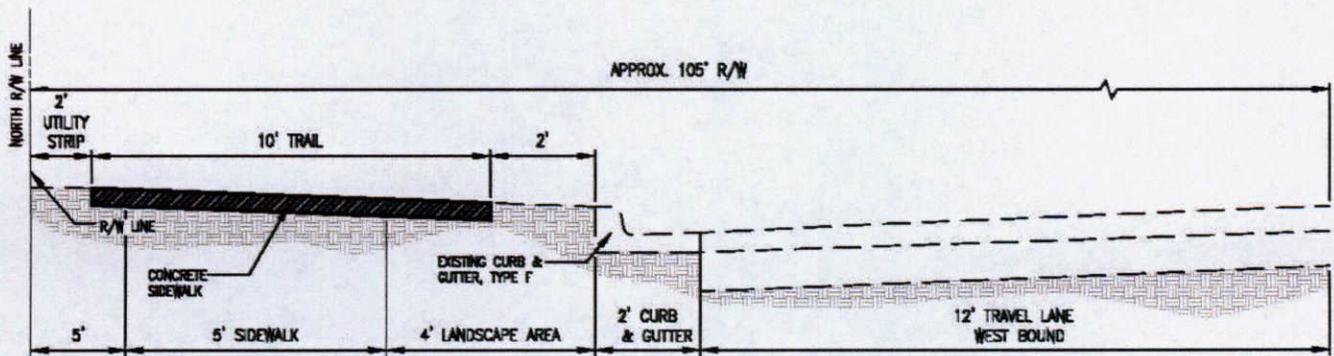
Typical Sections – Roadways & Trails – Section A
